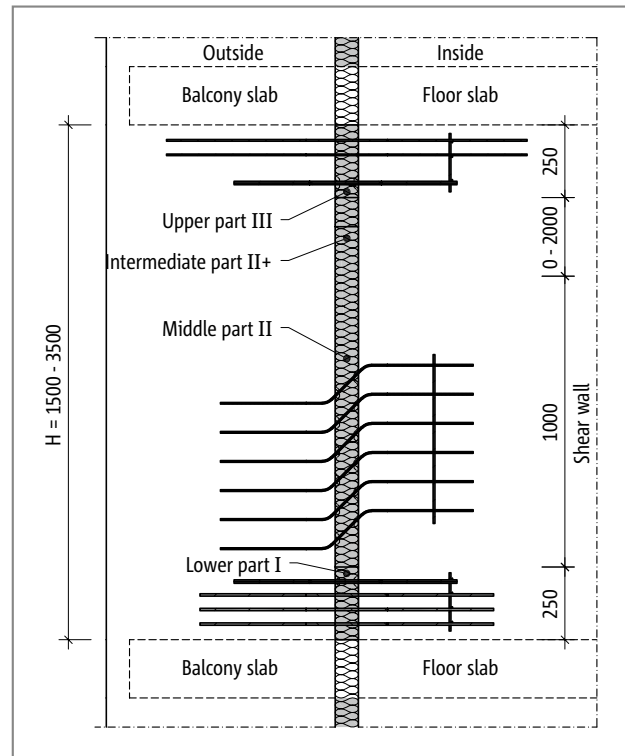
Schöck Isokorb® T type W: Balcony structure with thermal insulated load-bearing shear walls
